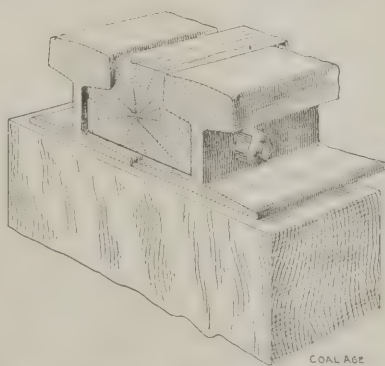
CROSSBAR OF TWO STEEL RAILS
